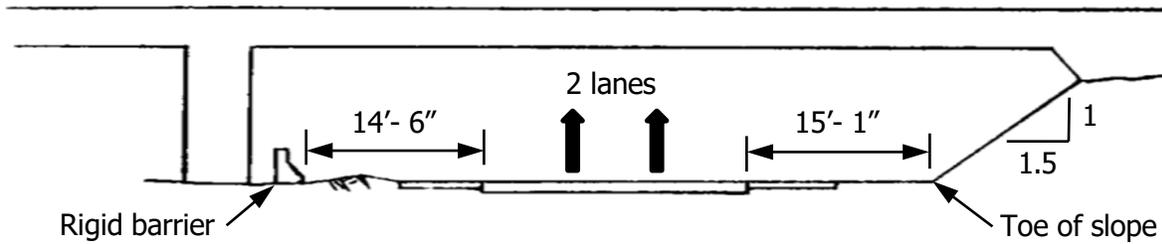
Bridge elevation view of horizontal clearances for a 2-lane, 1-way highway feature below the bridge, with a rigid barrier.
